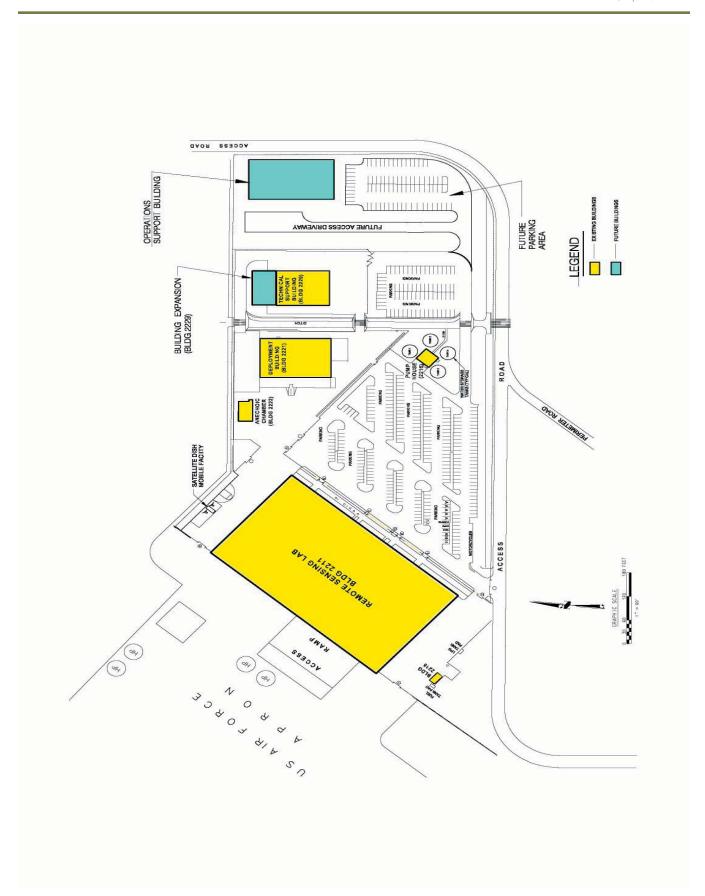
Remote Sensing Laboratory-Nellis Future Site Plan
